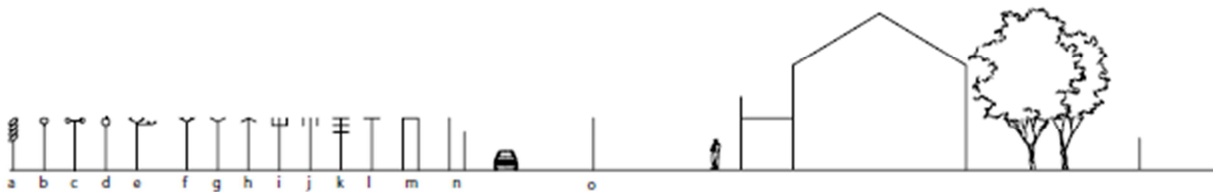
a)horizontal louvred b)mushroom capped c)double cylindrical capped d)waterwheel e)branched profile f)Y-profile with additional edges g)Y-profile h)arrow profile i)U-profile j)bracket attached to main barrier k)fir tree section l)T-profile m)thick barrier n)double barrier o)plain
